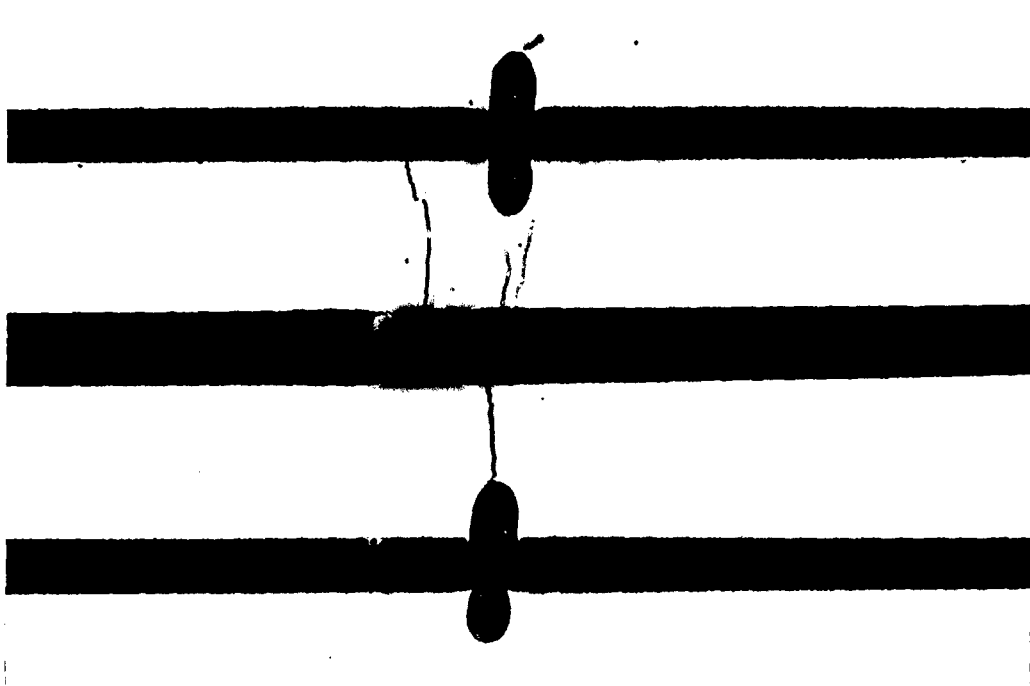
0.0035 mm/mm Specimen Fracture Surface
